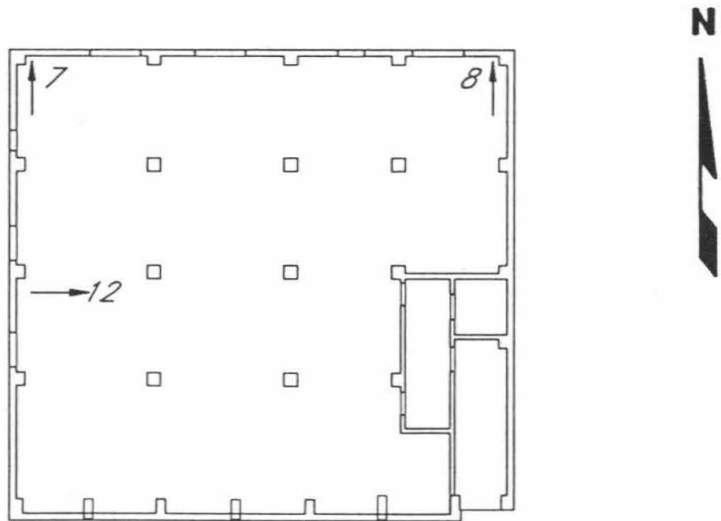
Plan View of Third Floor, Elevation 34'-4"
